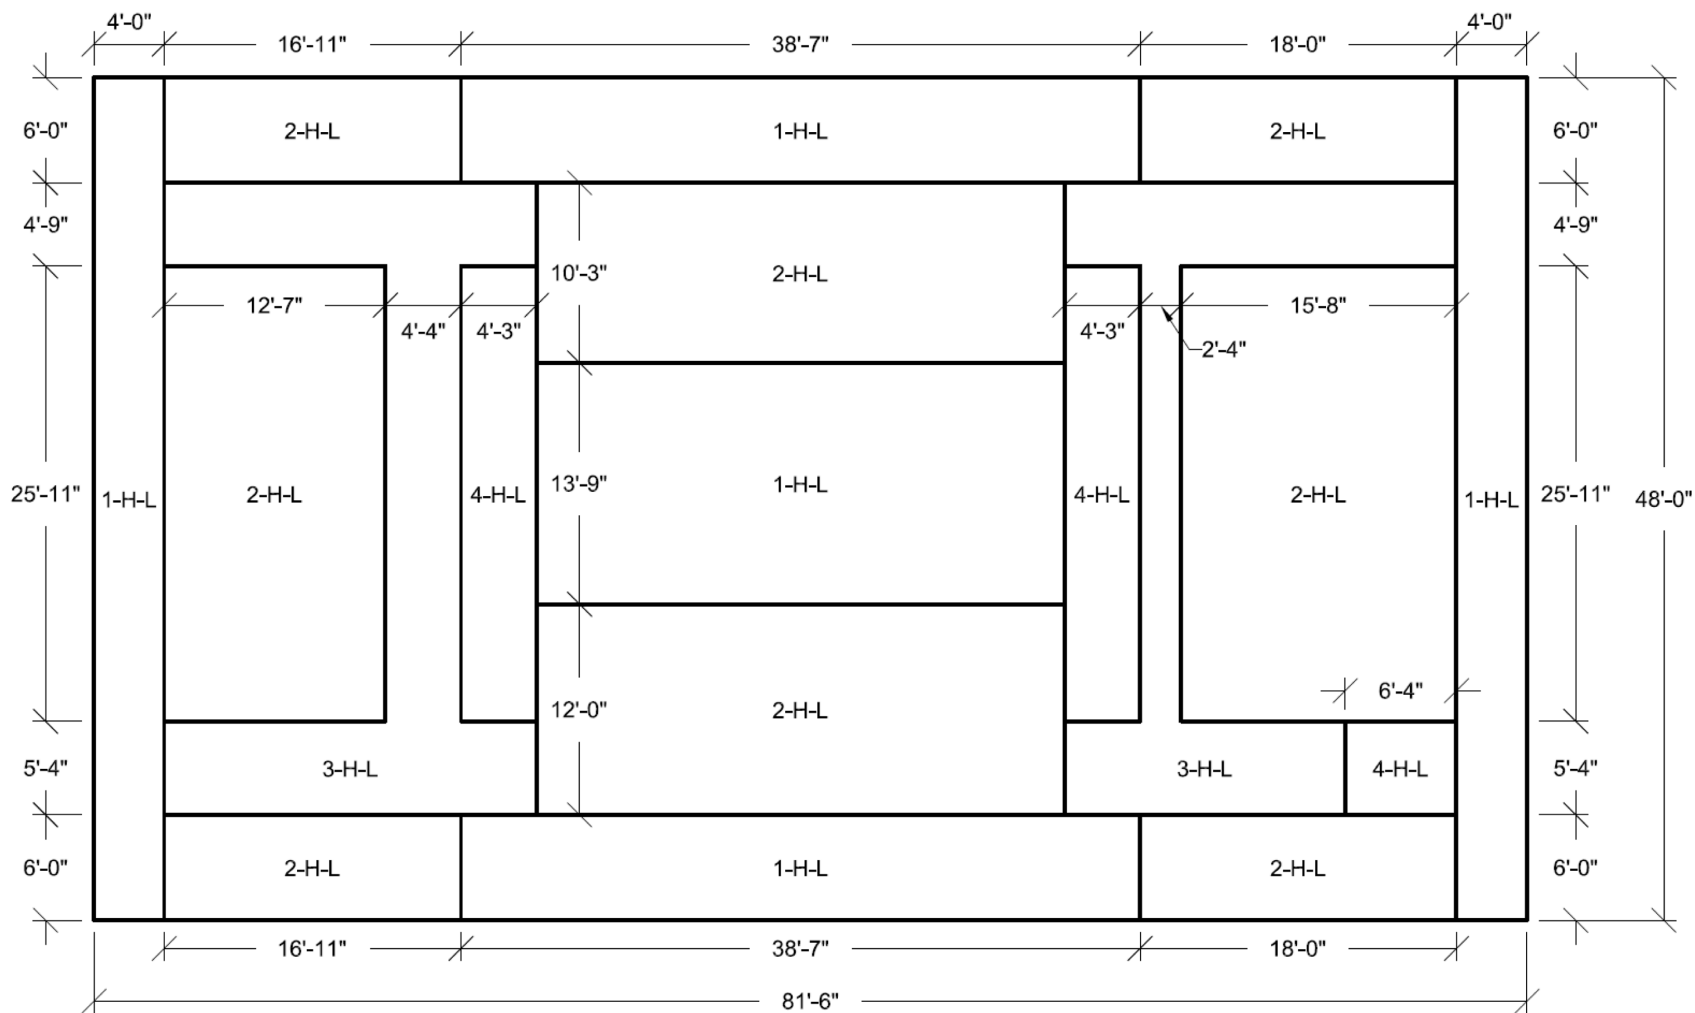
H.6-144 DGFOV Slab 1 Looking Down
